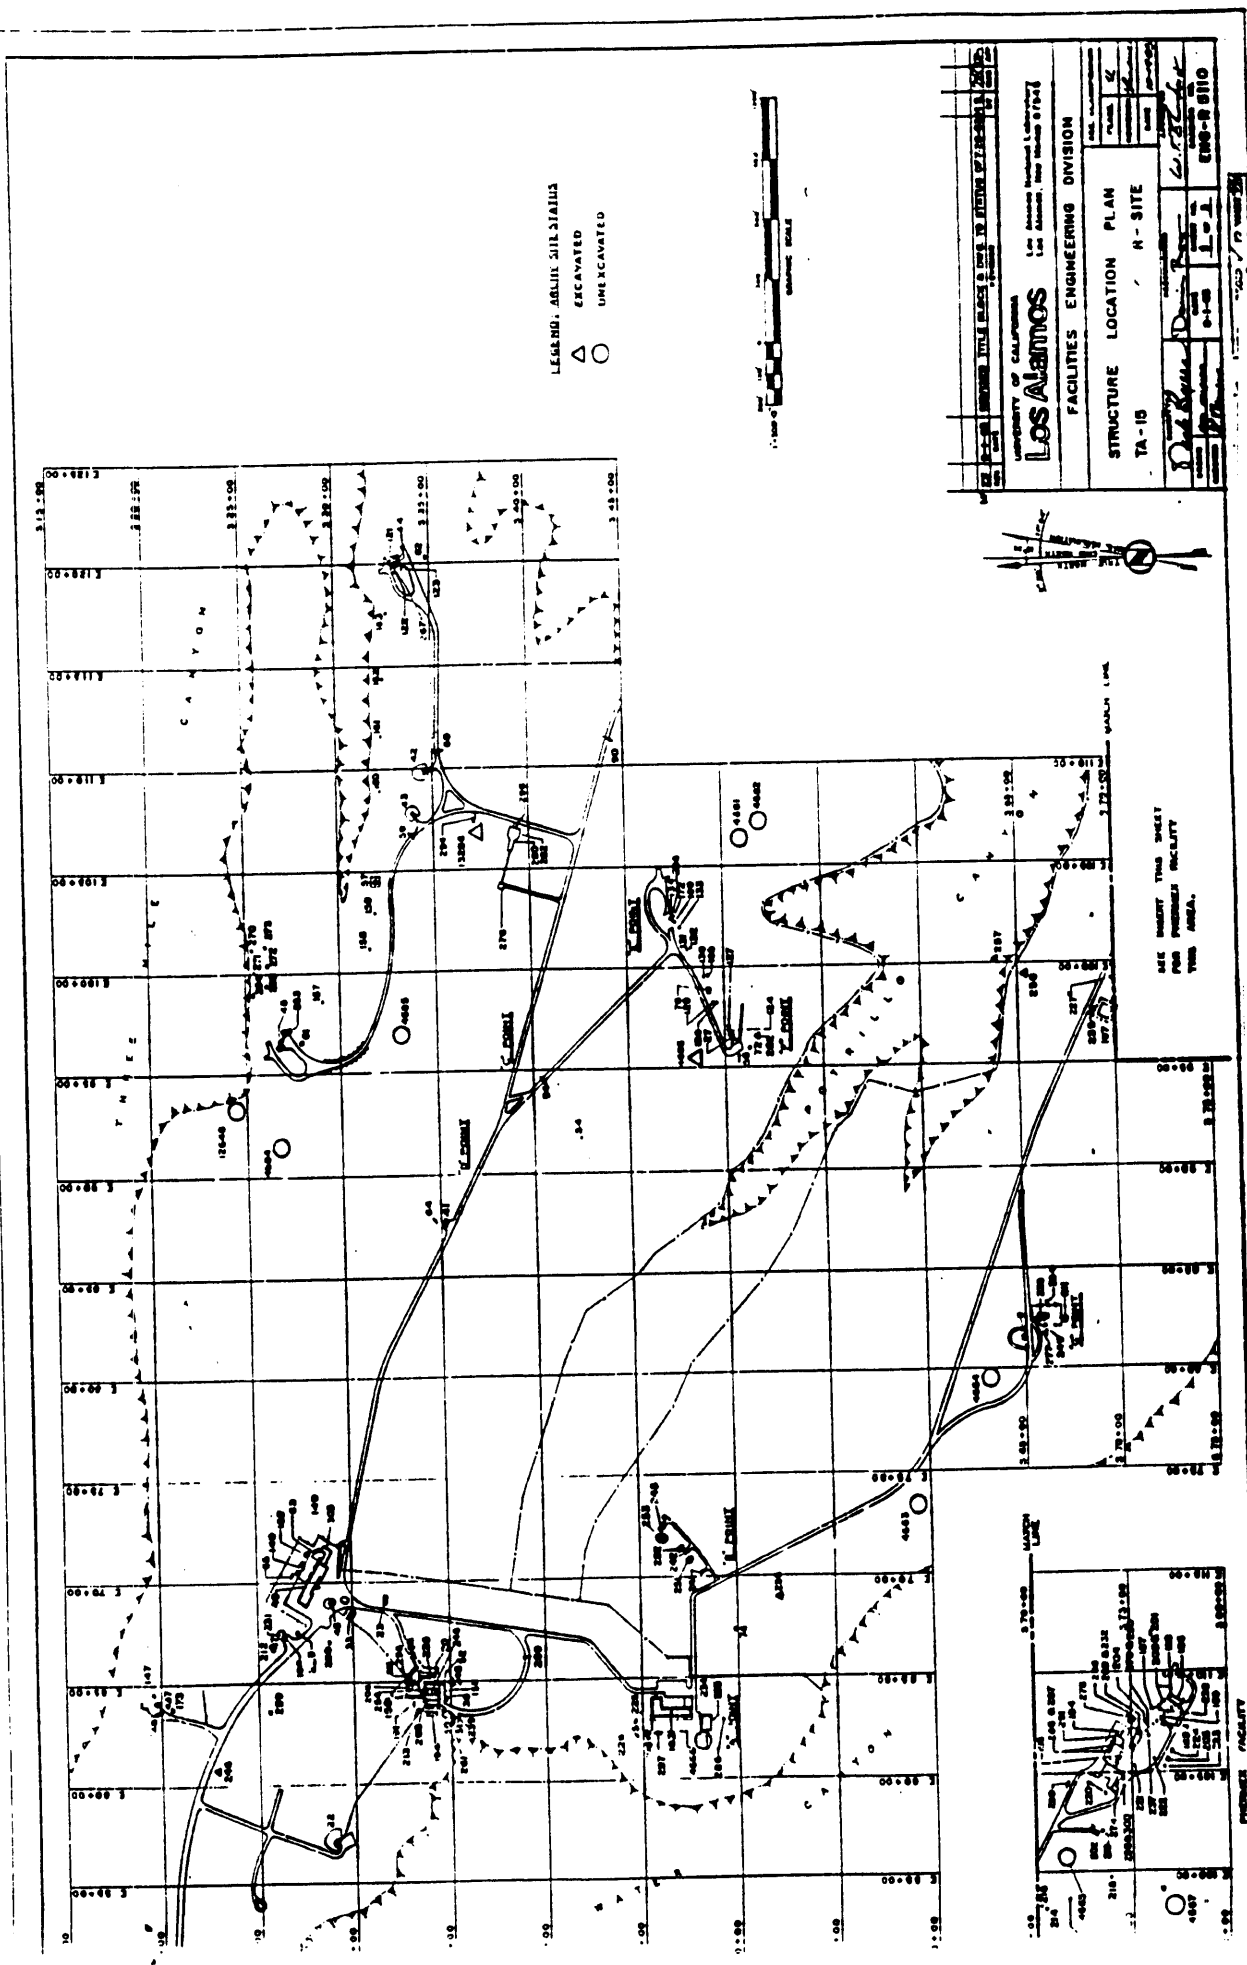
Structure Location Plan, R Site, TA-15 (ENG-R 5110)
